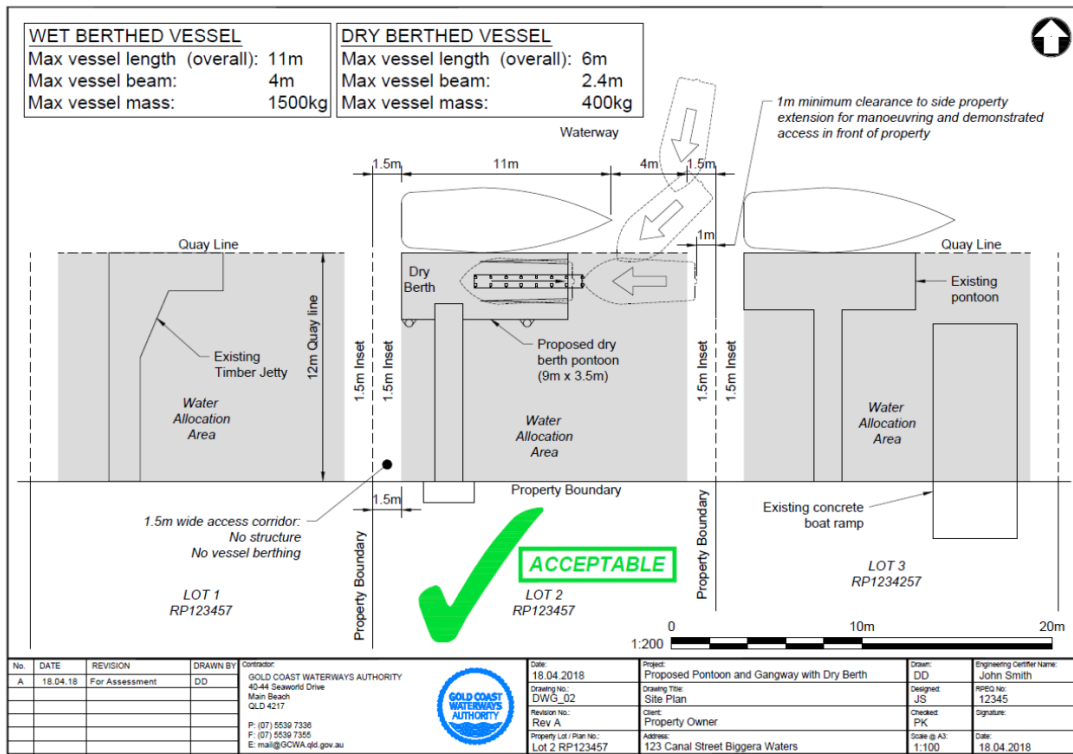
Example of acceptable site and layout plan and water allocation area plan
